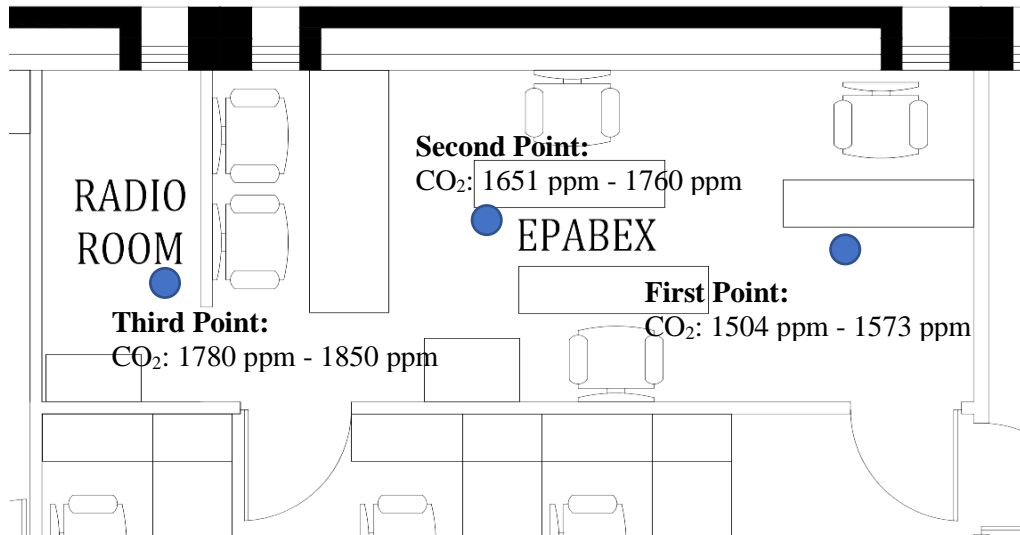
EPABEX in the Third Floor Plan (SNGPL)
